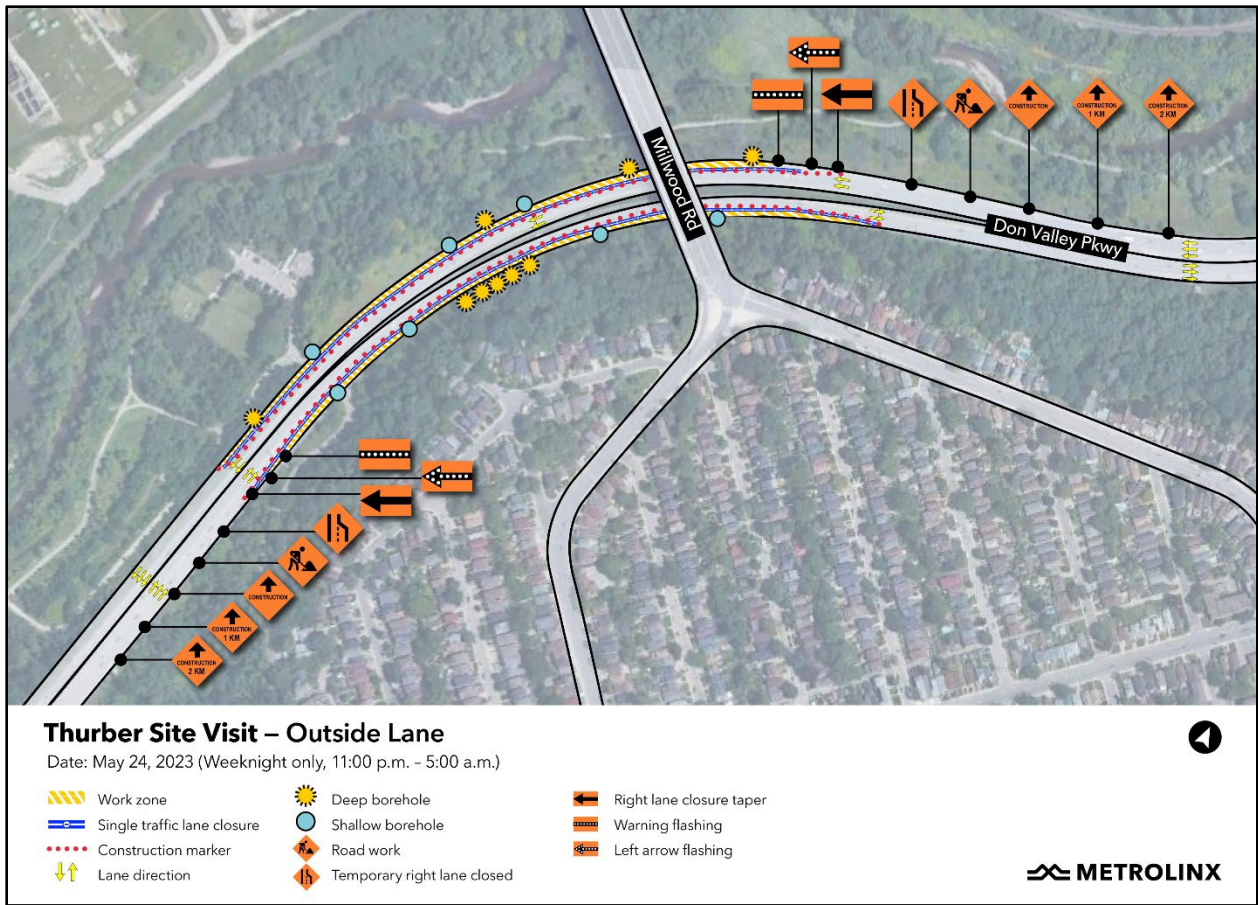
Geotechnical Site Visit (Outside Lane Occupation)
